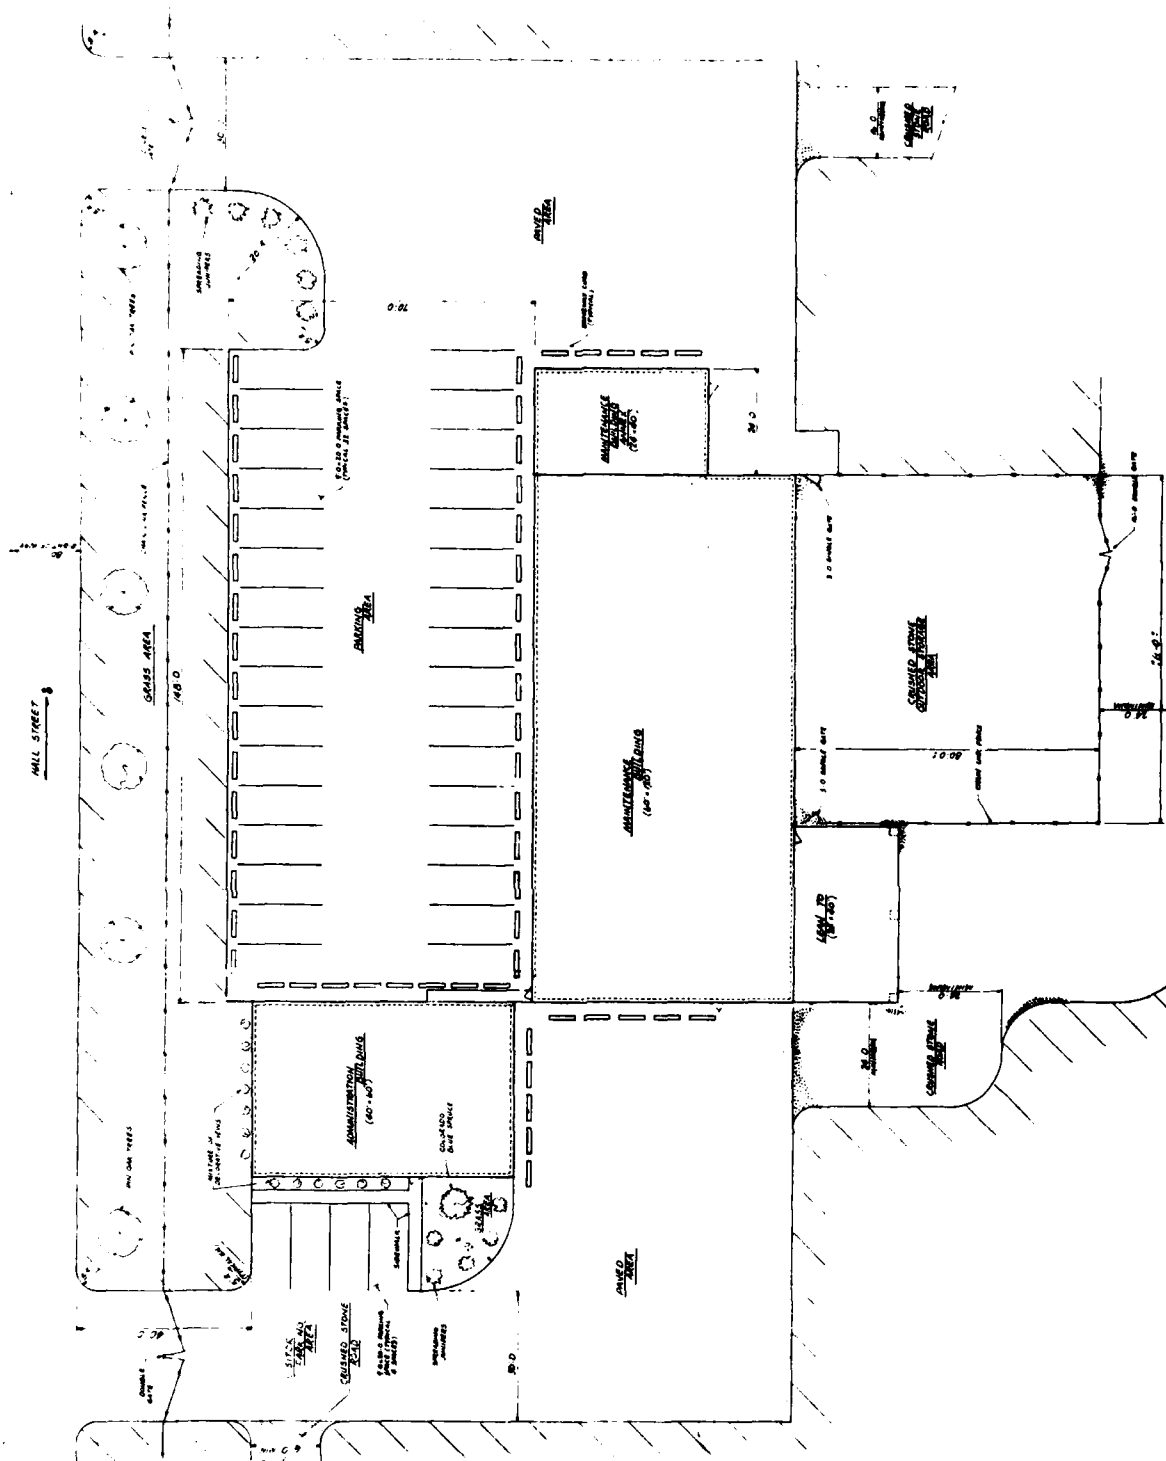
ADMINISTRATION AND MAINTENANCE FACILITY PLAN
